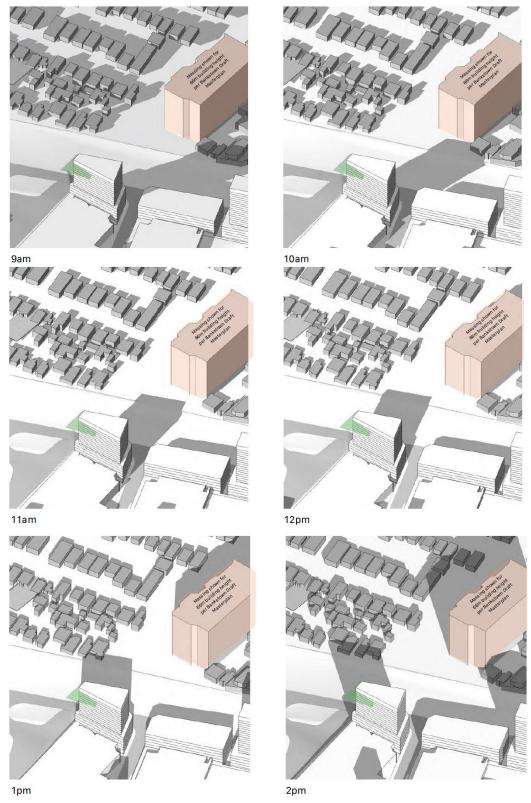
Shadow diagrams relating to a 65m tower in the location of Tower P
